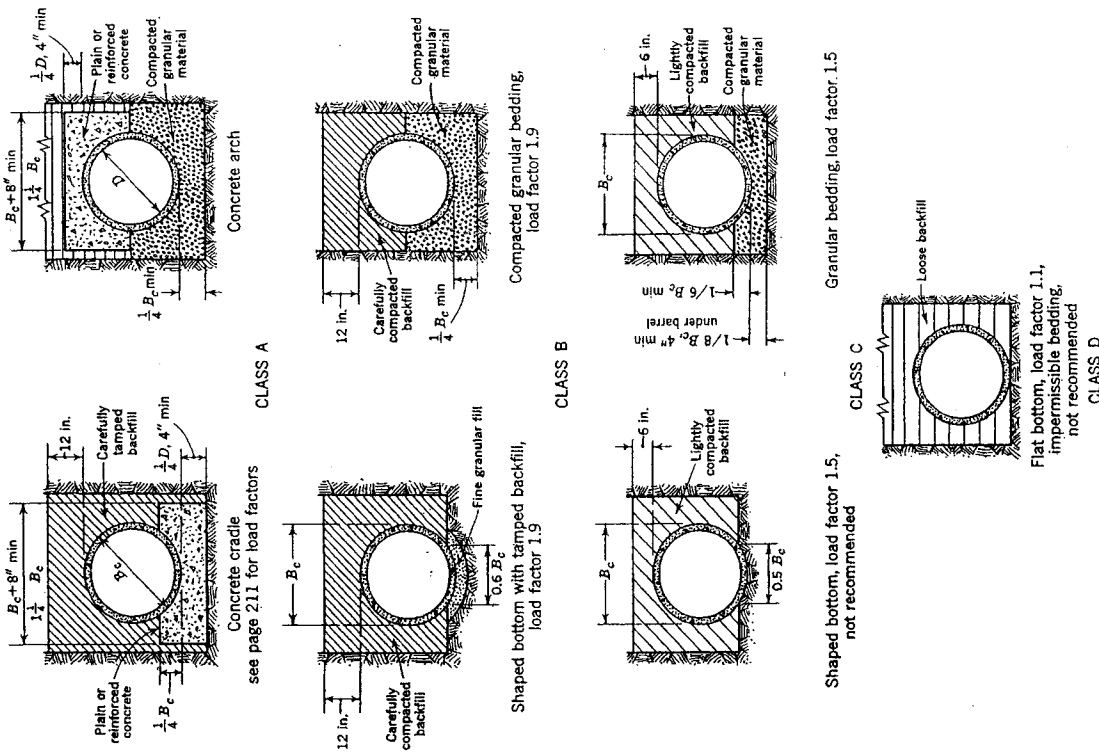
Classes of bedding for conduits in trench. Note: In rock trench, excavate at least 6 in. (15 cm) below the bell of the pipe except where concrete cradle is used.
